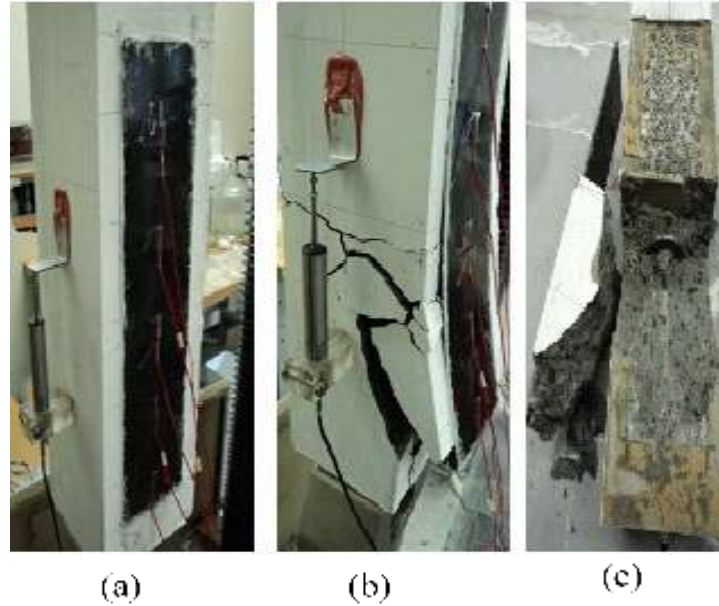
Double-lap pull-off specimen (a) initial split between two concrete prisms at separation line (b) dislodged piece of concrete with FRP laminate after failure (c) FRP laminate with big chunk of concrete
